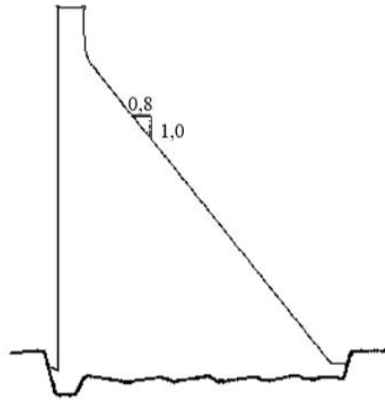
Gravity dam. Typical cross section (adapted from INAG, 2001)
